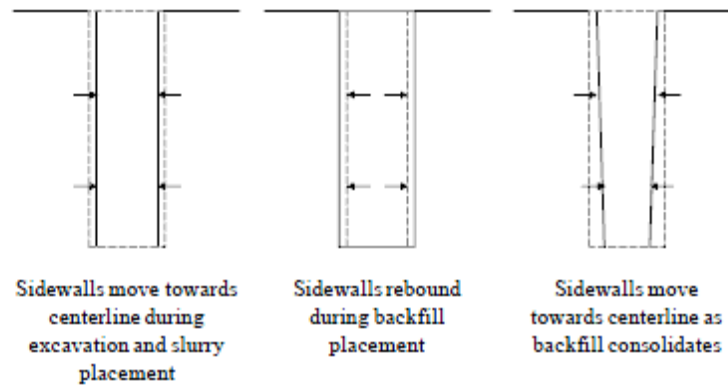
Stages of sidewall movement during construction and consolidation of a SB cutoff wall (from Ruffing et al. 2010).
